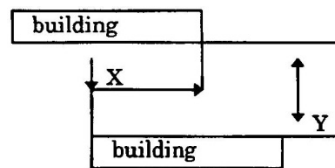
Typical Minimum Distance between Parallel or Nearly Parallel Building Walls of Single-Family Attached Dwelling Buildings
